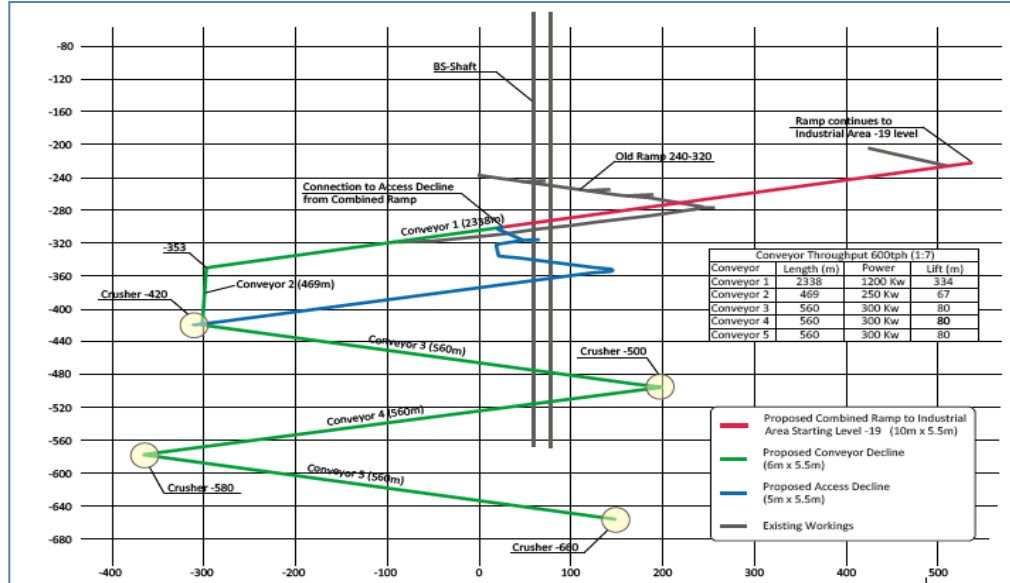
Blötberget Conveyor/Access Schematic Plan
